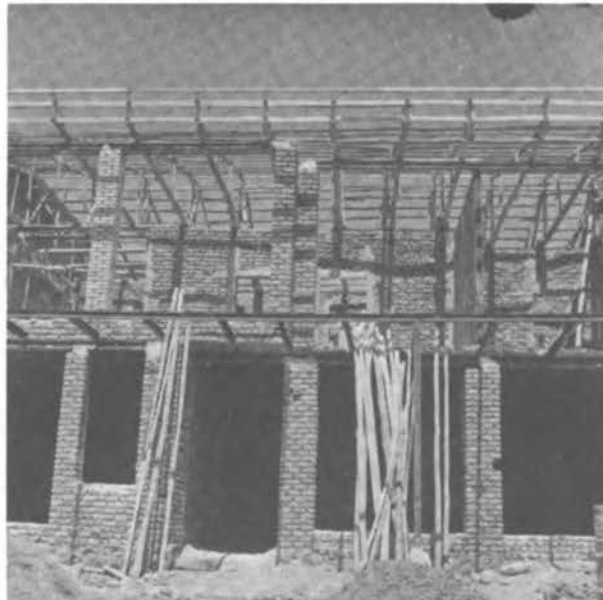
A Typical Two-Story Brick-Masonry House with Shiravani Roof.
